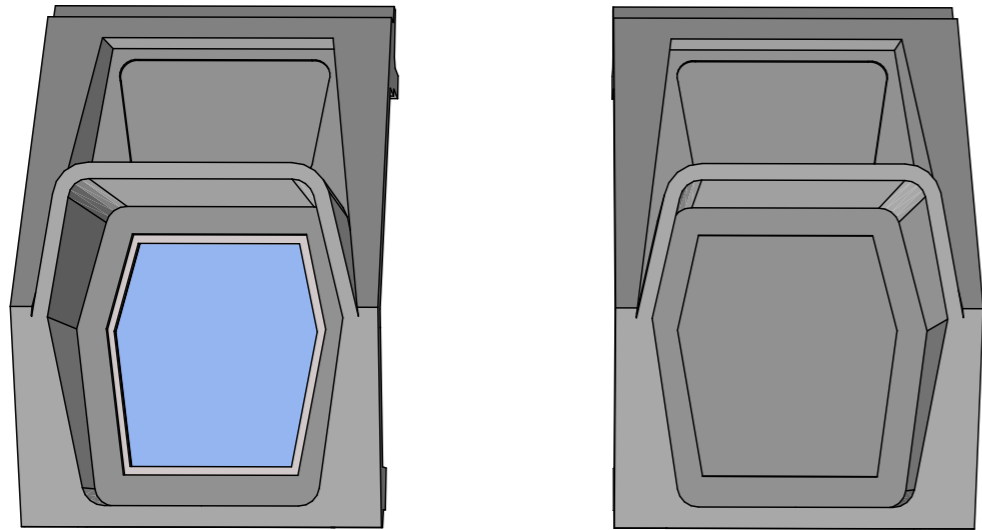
ORIGINAL PREFABRICATED TOWER FAÇADE ELEMENTS. LEFT: WINDOW MODULE WITH REFLECTIVE DOUBLE GLAZING MIRRORING THE SKY. RIGHT: ENCLOSED CONCRETE FAÇADE MODULE.
